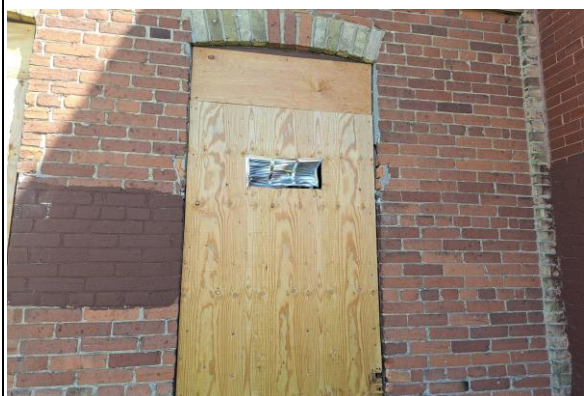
One damaged louvered vent in the plywood on the west side of part 1 building is to be removed and replaced.
